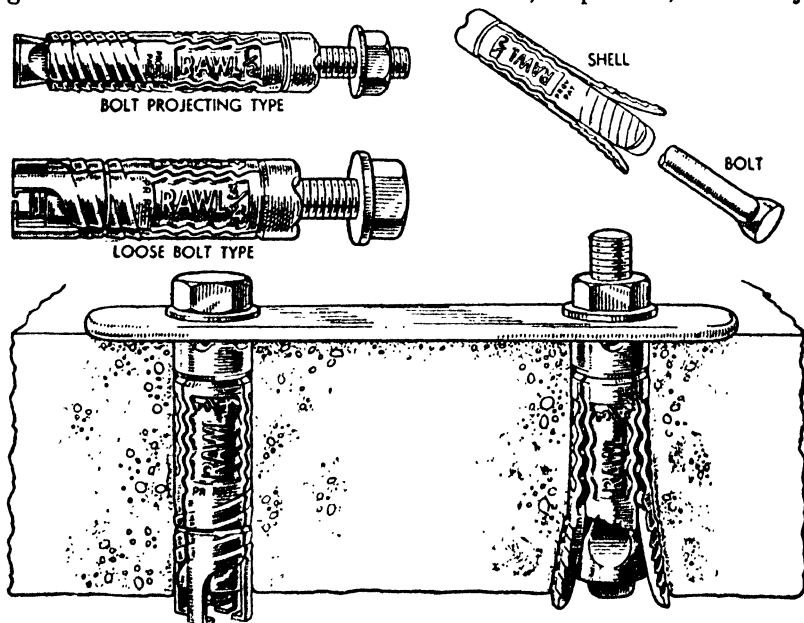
Expansion bolts for fastening heavy work to stone or concrete. The bolt projecting type expands the shell when the nut is tightened. In the loose bolt type, the shell expands when the bolt is tightened. The latter type is useful in fixing heavy machinery which is difficult to lift over bolts.
